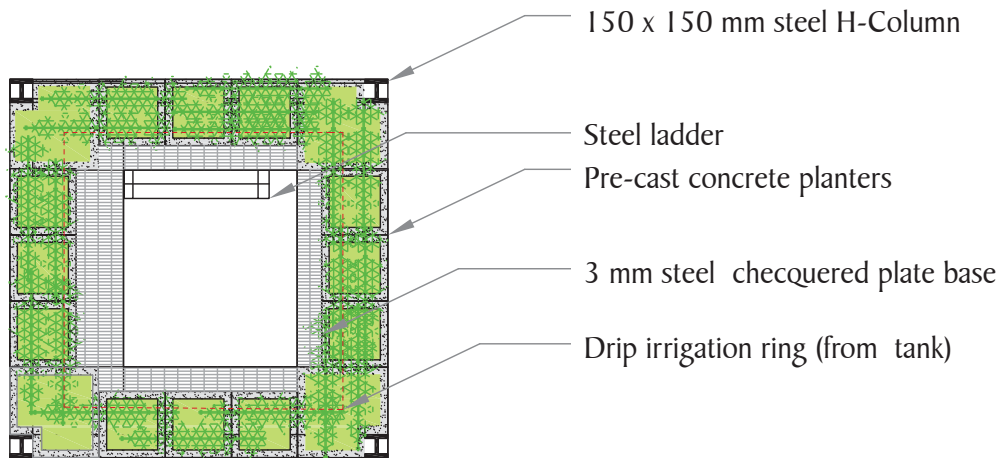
Plan view of green plarforms (Author, 2008) Scale 1: 50
